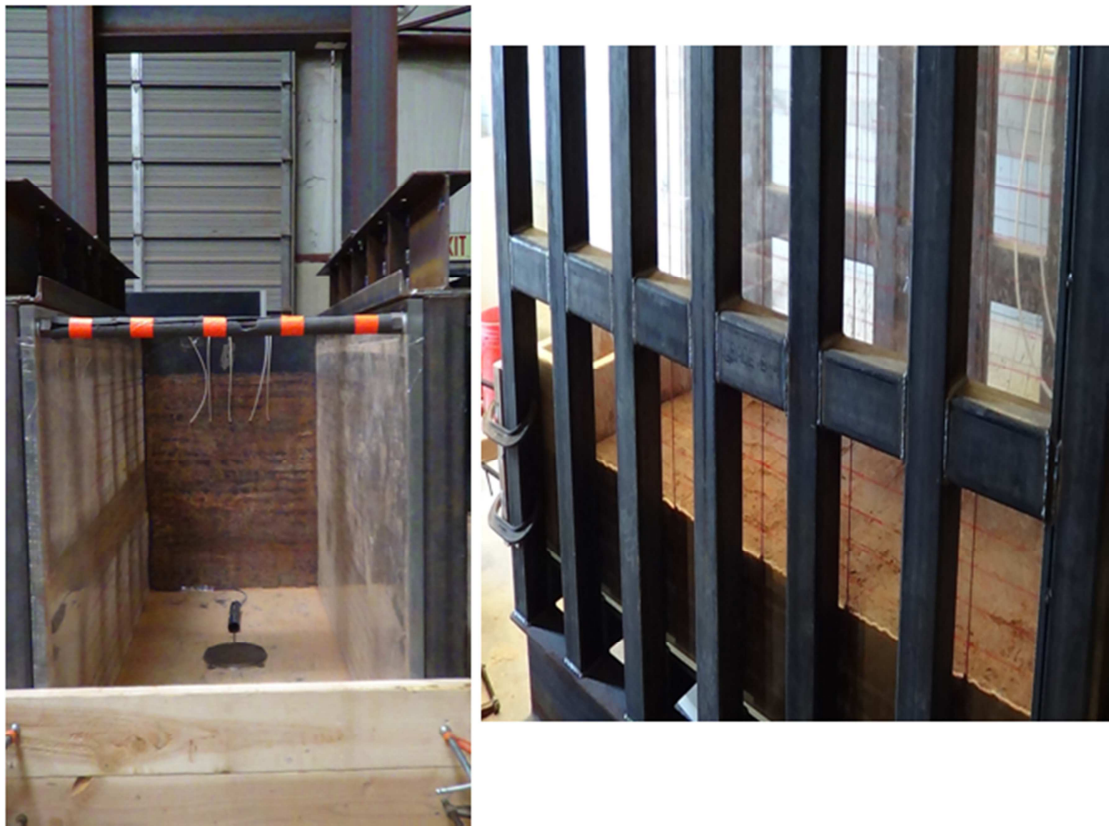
Test box and self-reacting loading frame fabricated for the reduced-scale reinforced embankment tests
